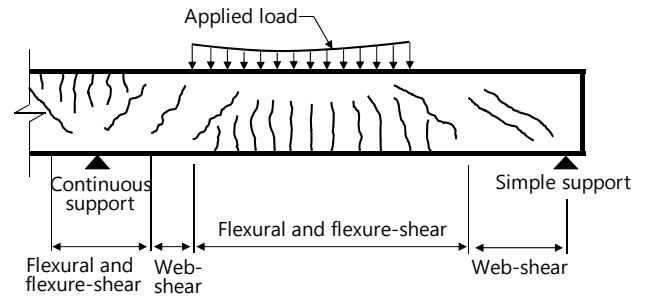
Types of cracking in prestressed concrete beams
